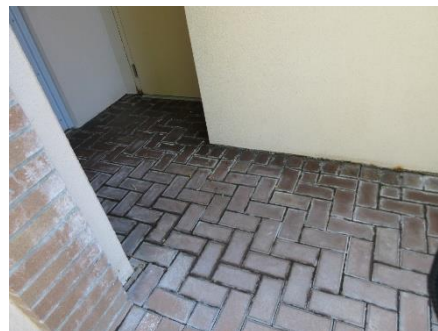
Staining on pavers near plugged drain indicating ponding water in the area.
